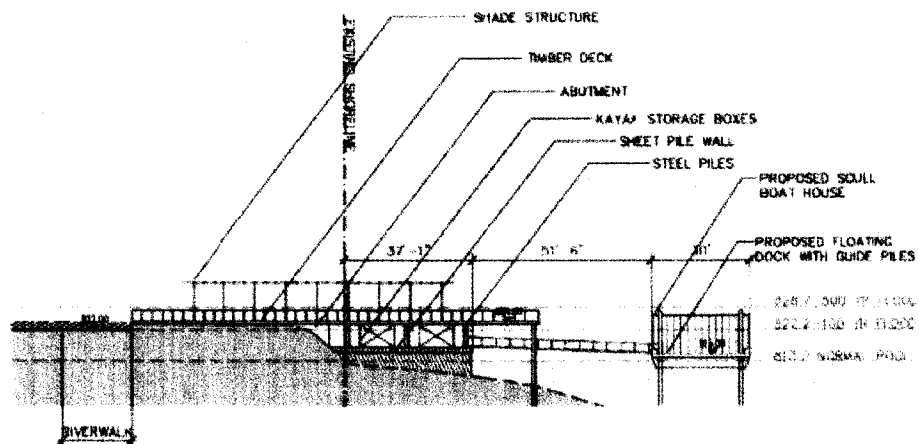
Schematic Design, Section I, Scale 1"= 30' (Hargreaves Associates, 2008).
